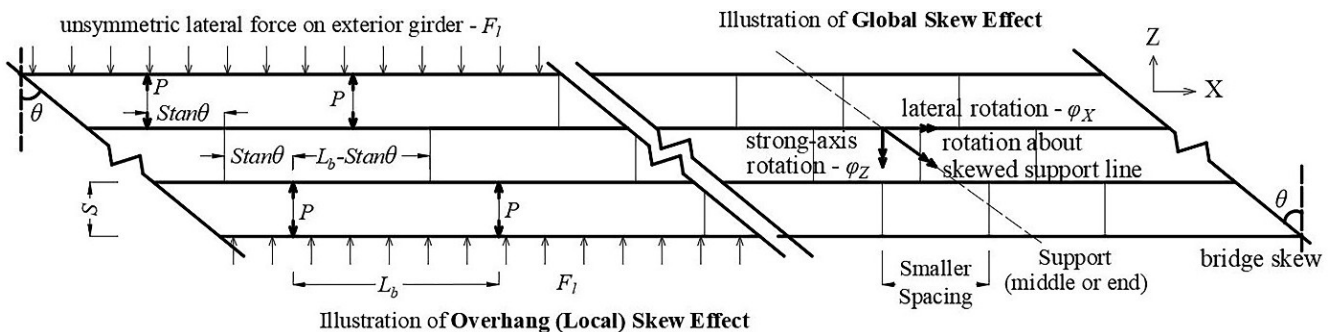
Plan view. Lateral load transfer of a typical skewed bridge at the bottom flange.
